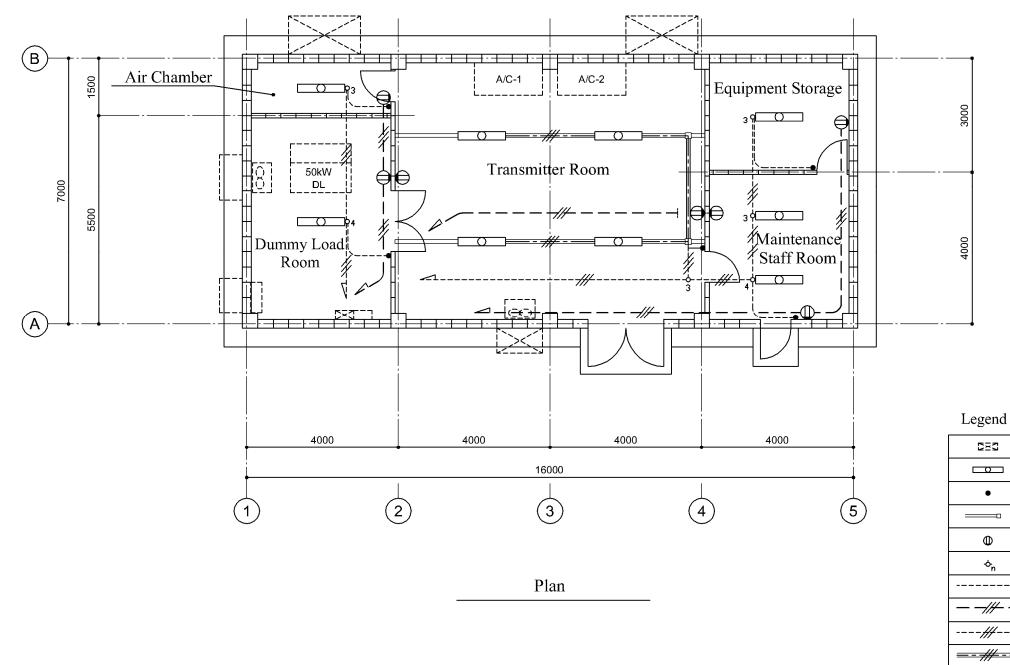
Mawagga and Kyeriba MW Transmitting Station Buildings / Plan for Electrical Installation
